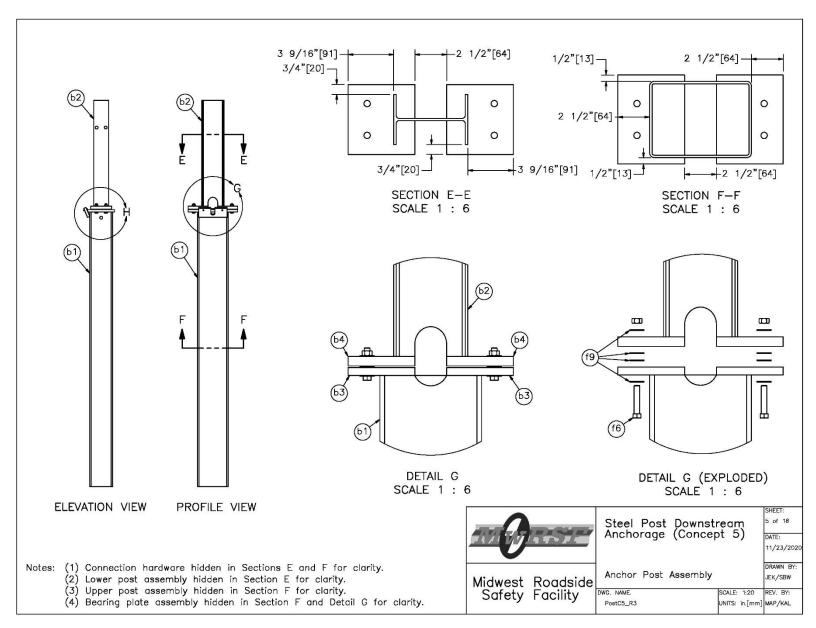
Anchor Post Assembly, Test No. SPDA-5
